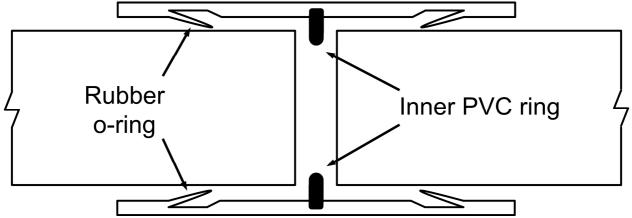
Scheme of typical Dutch PVC joint with double rubber ring. Both the rubber o-ring and inner PVC ring are shown. Image not at scale.
